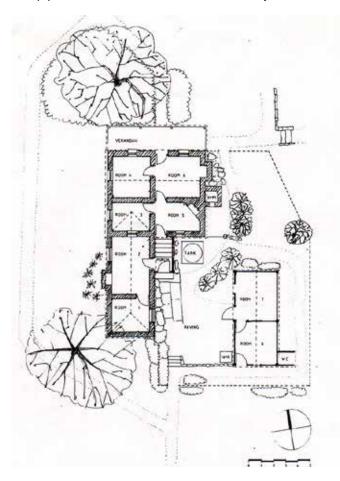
Plan of Blundells Cottage after addition to Slab Shed by Oldfields. Source: Freeman Collett & Partners Pty Ltd 1994, Blundells Cottage Precinct CMP
